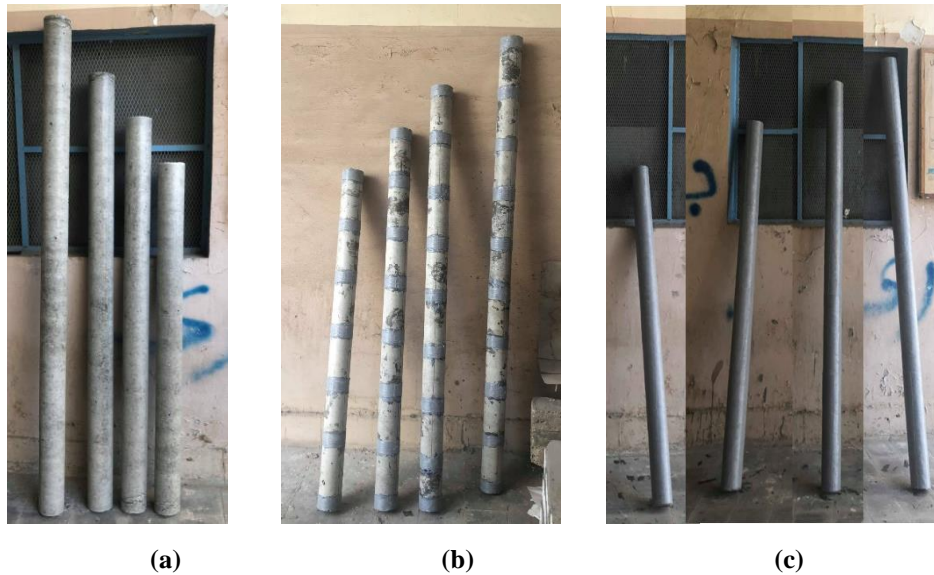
The test specimens (a) control C16, C18, C20 and C22 (b) partially wrapped P16, P18, P20 and P22 and (c) fully wrapped F16, F18, F20, F22.
